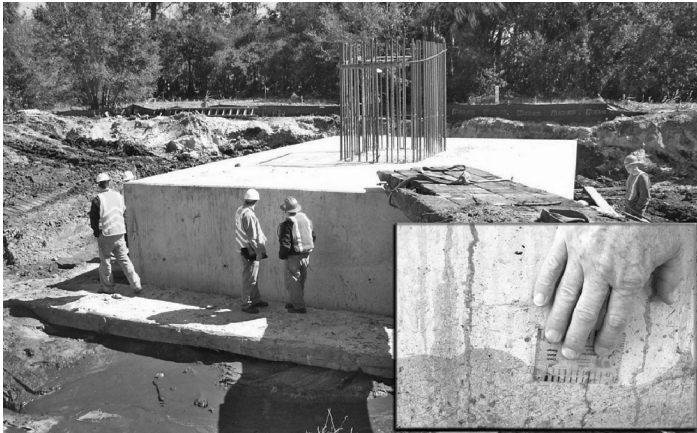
Cracked concrete foundation and close-up view of thermal cracking
